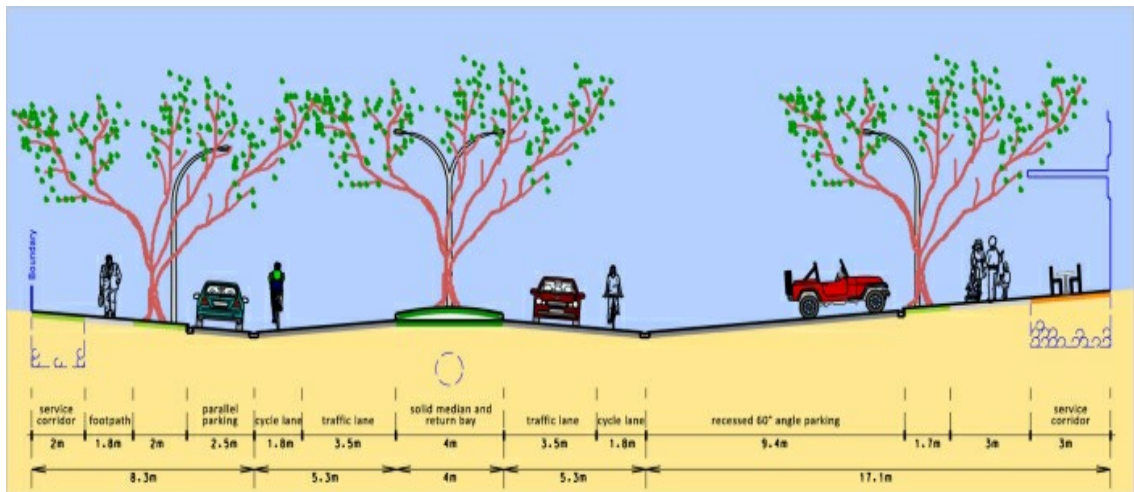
Rotokauri Cross-sections - Collector
